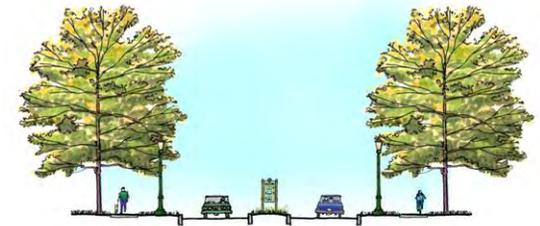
The new gateway would include a 10' wide boulevard, gateway signage, lights, sidewalks and a bicycle/snowmobile trail.
